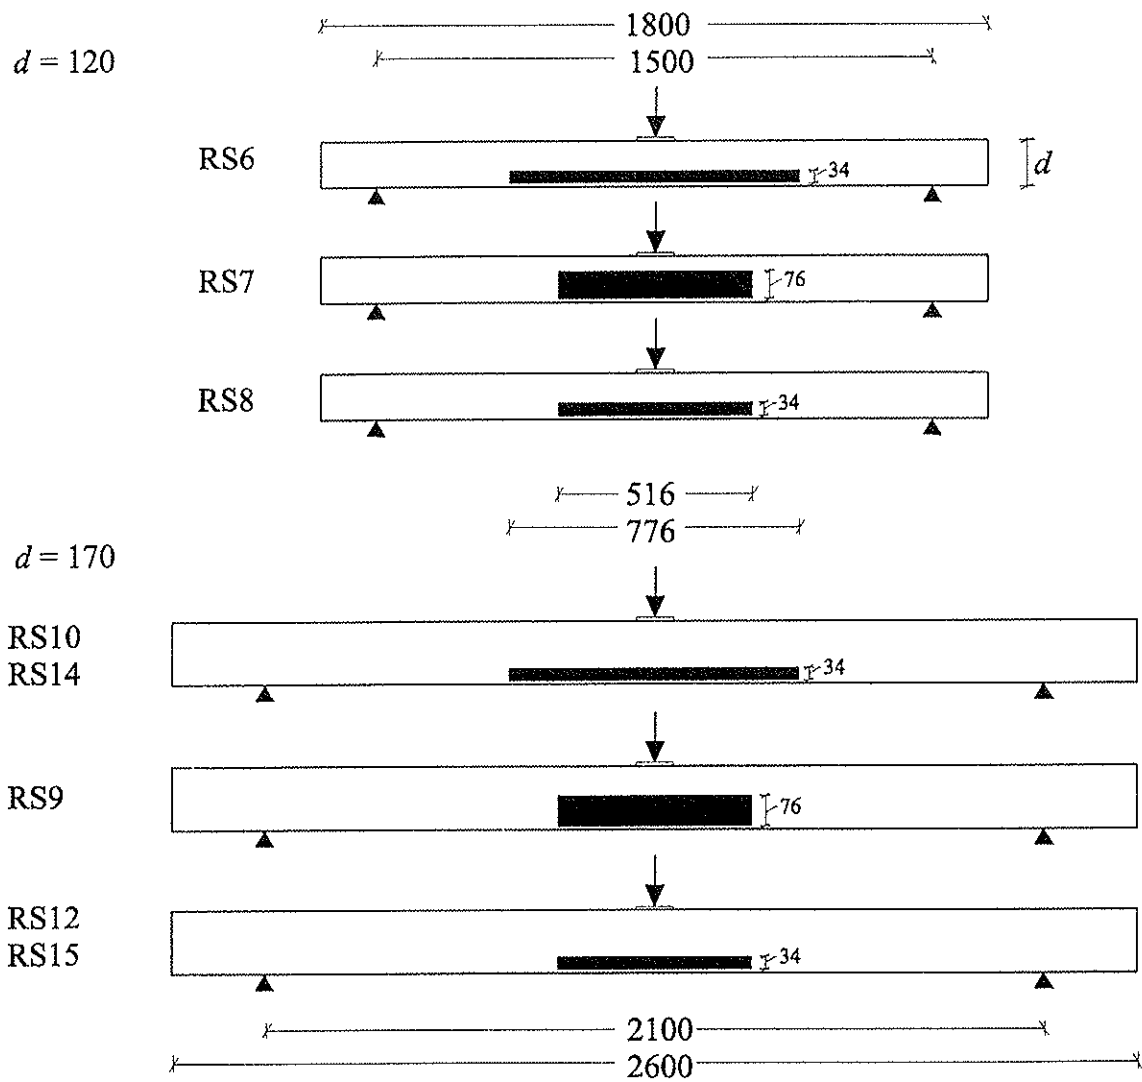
Test specimens with plate reinforcement. Dimensions in mm.
